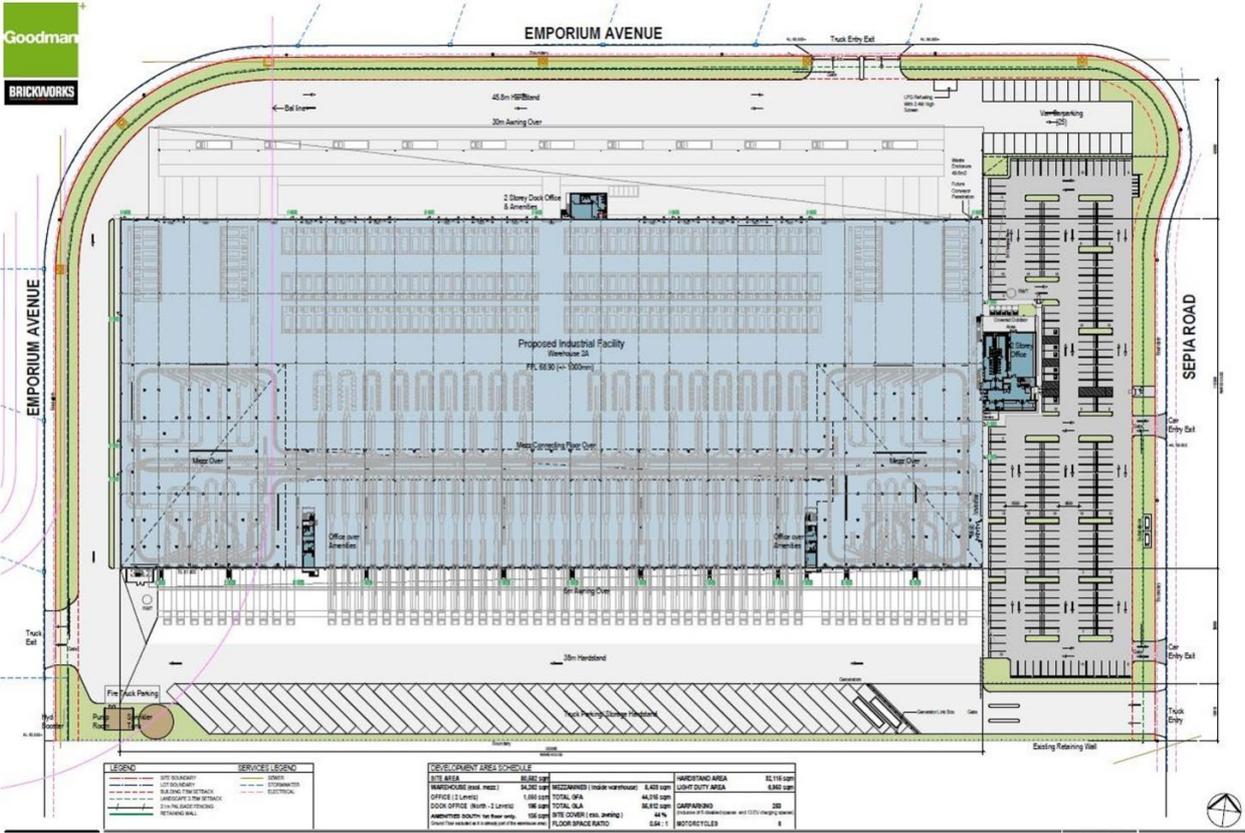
Oakdale West Estate, 2A Site and Warehouse Plan
